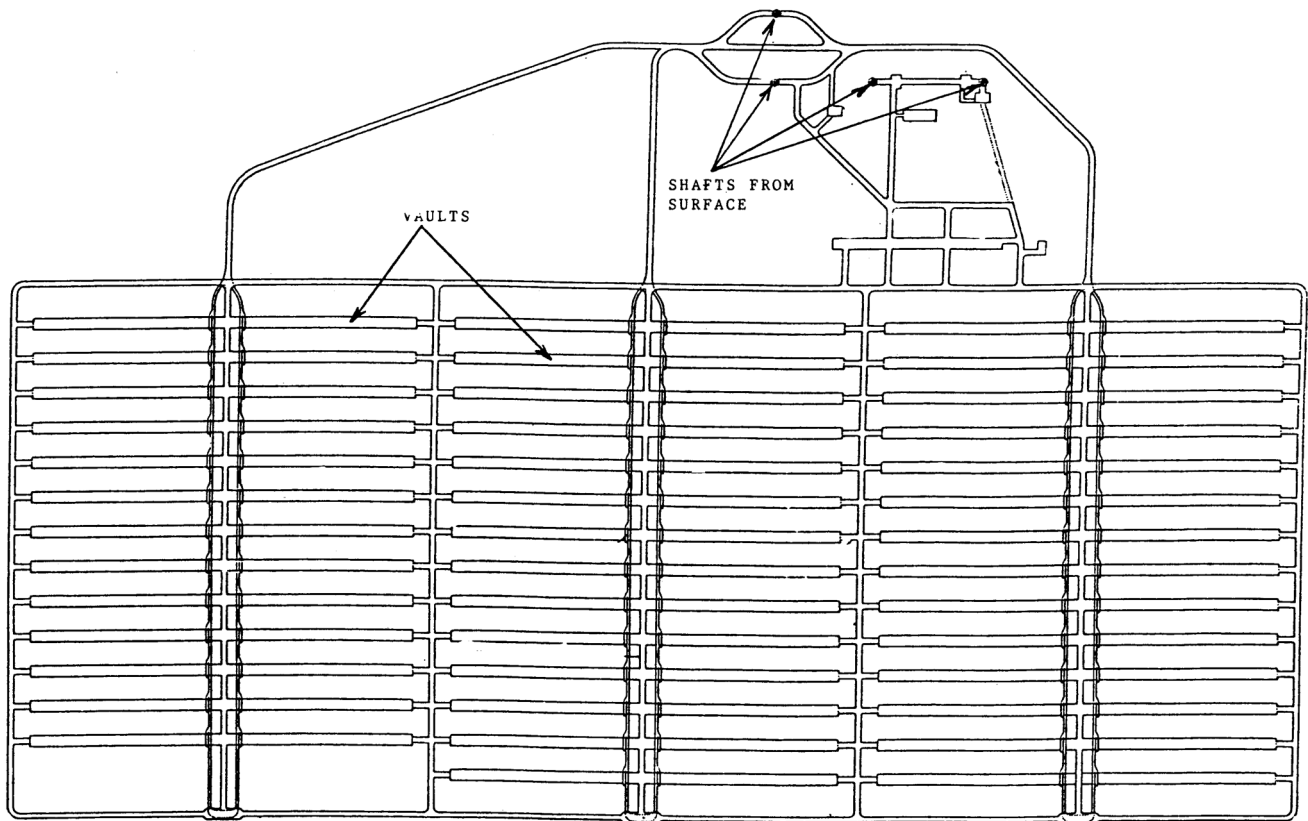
Sellafield Repository: Outline Design Showing Vault Layout
